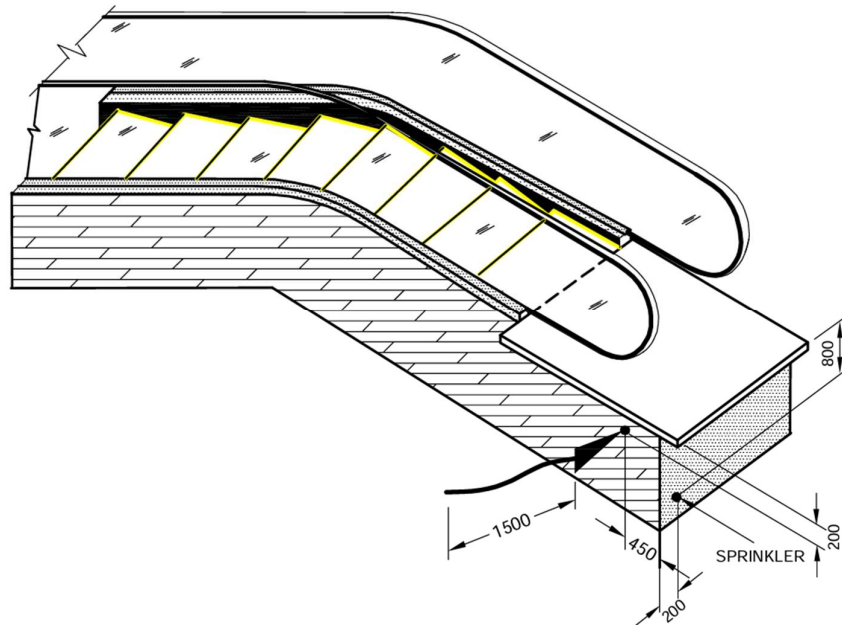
TYPICAL SPRINKLER PIPING ARRANGEMENT
